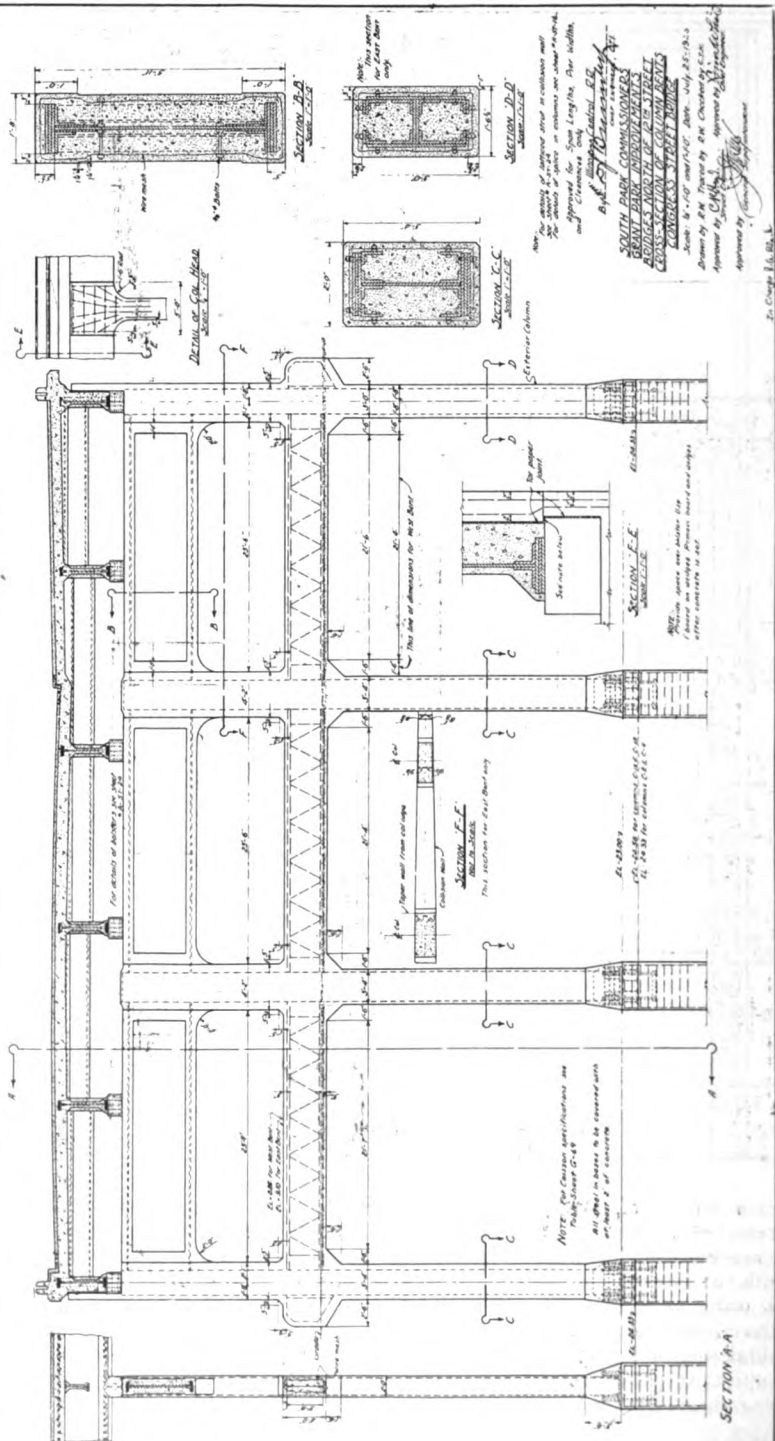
CROSS SECTION SHOWING TRANSVERSE GIRDERS.
